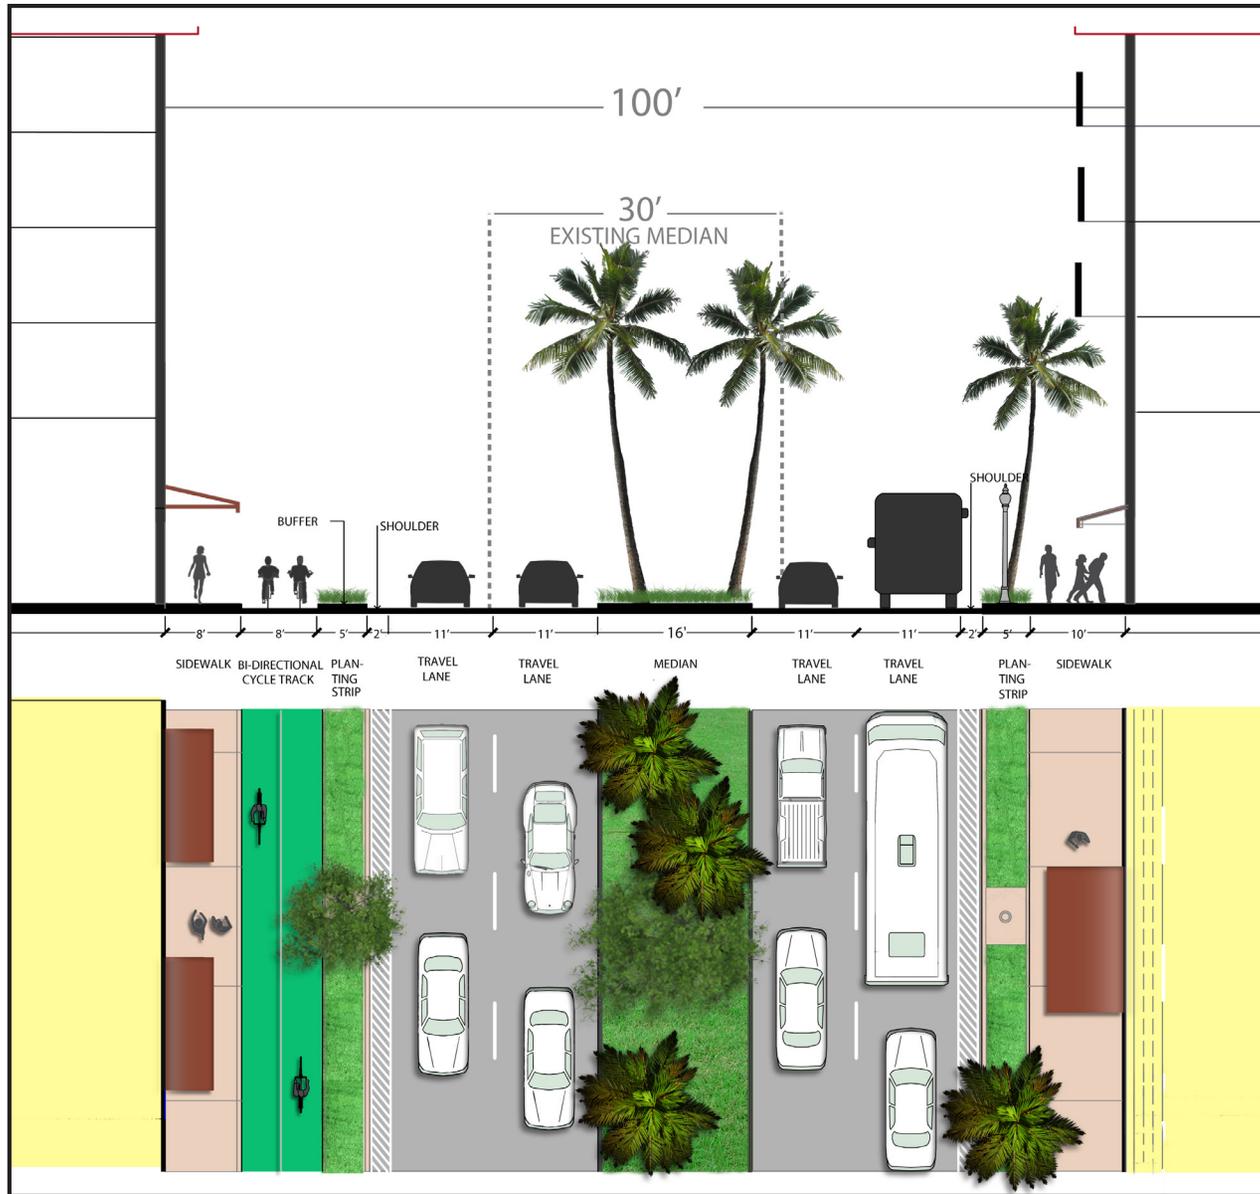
Cross-Section of the NW 82nd Avenue Right-of-Way Looking South
